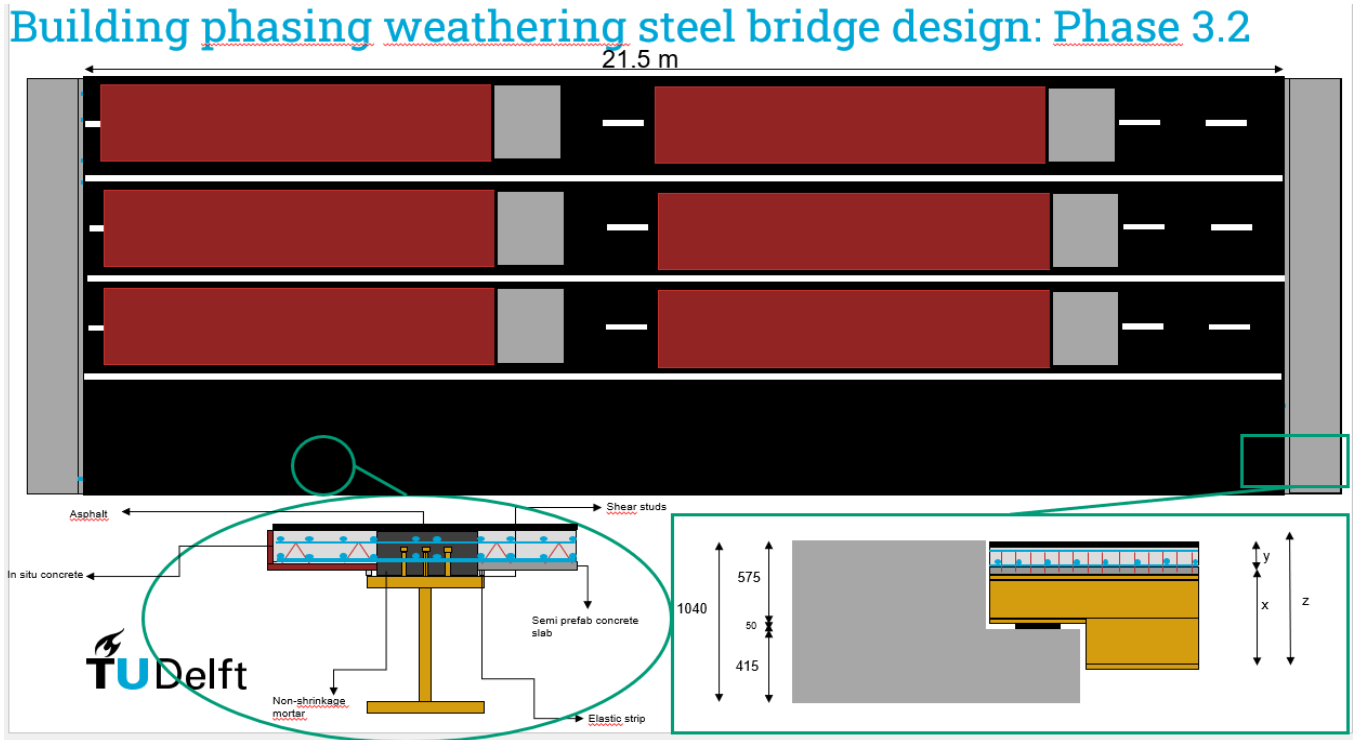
phase 3 composite action between beam elements and concrete deck under asphalt and traffic load
